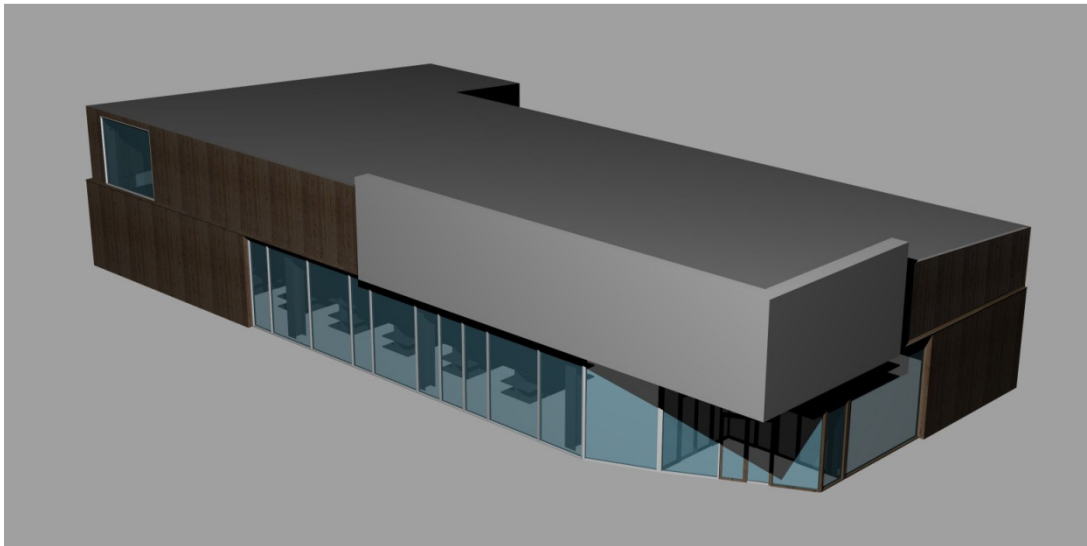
Case Study #5 – Predominately Timber Single-Storey Retail Building
